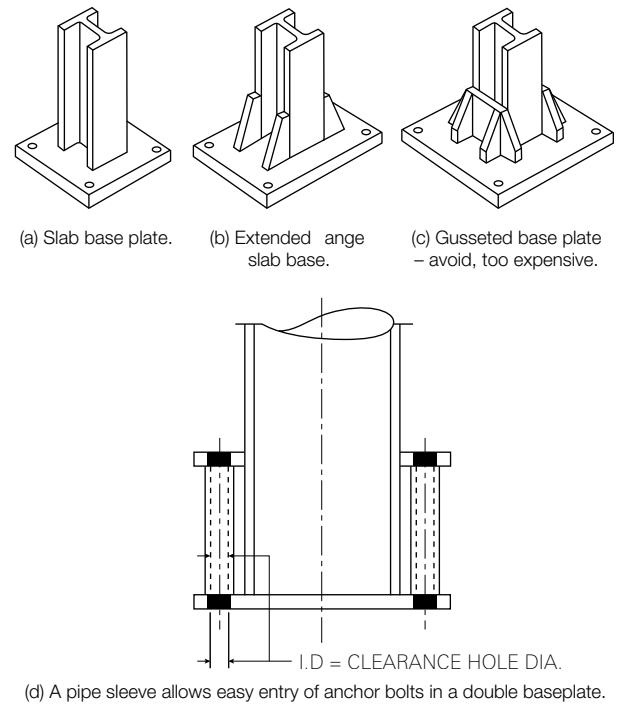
Column base plate details (moment resisting or fixed)
